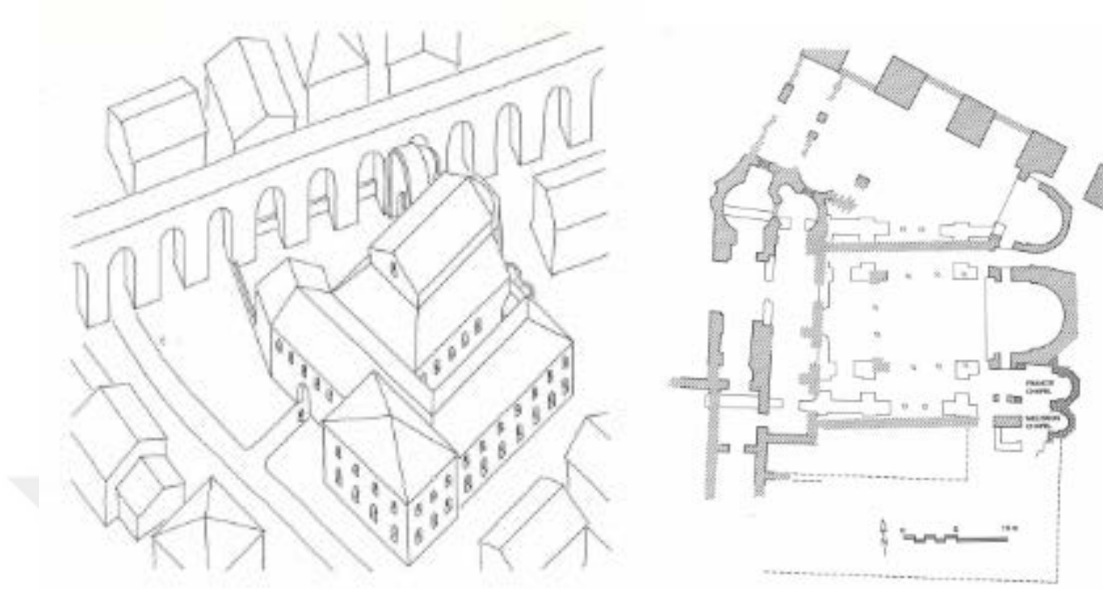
Reconstruction sketch and site plan in the 10th/12th c.
